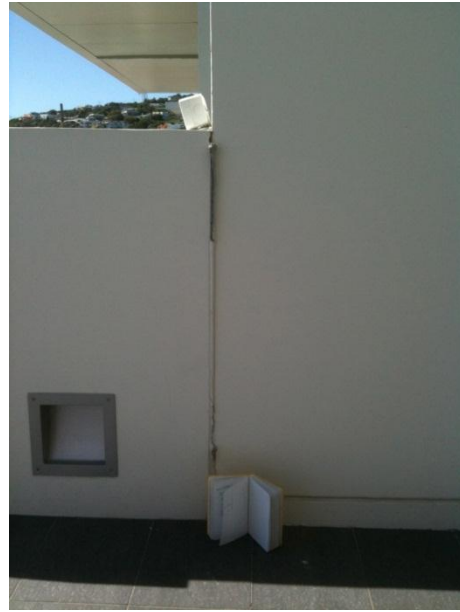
Photograph of apartments looking toward the south west. (-43.5577°, 172.7066°)
